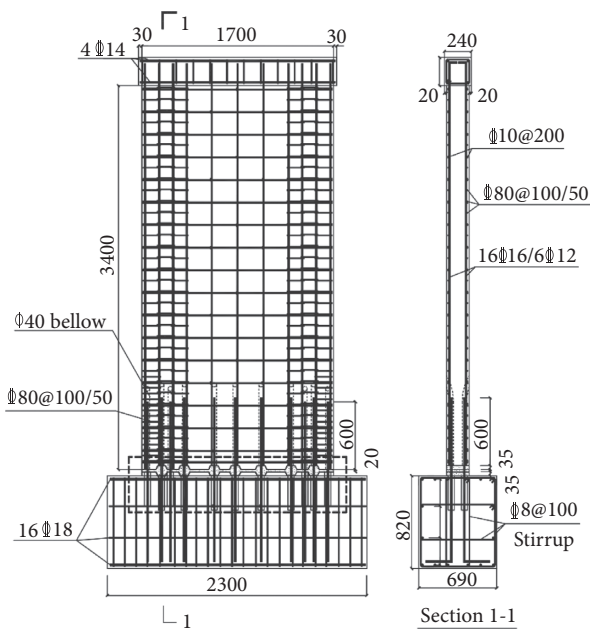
Dimensions (mm) and reinforcement configuration of the test specimen.
